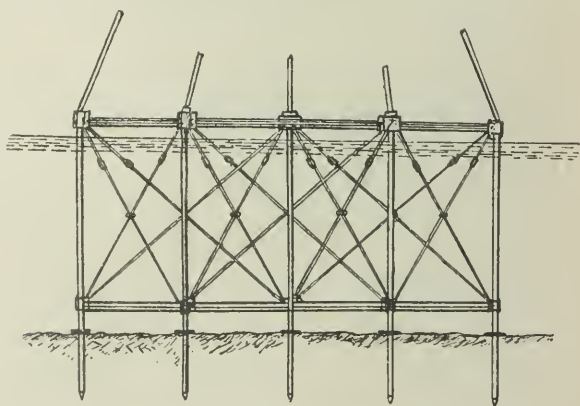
LIGHTHOUSE FOUNDATION ON PILES.
